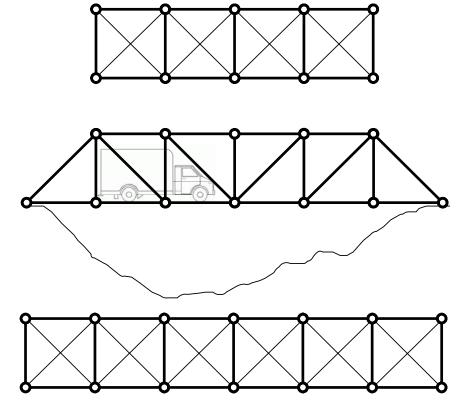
2-axle lorry crossing a Pratt truss bridge.
